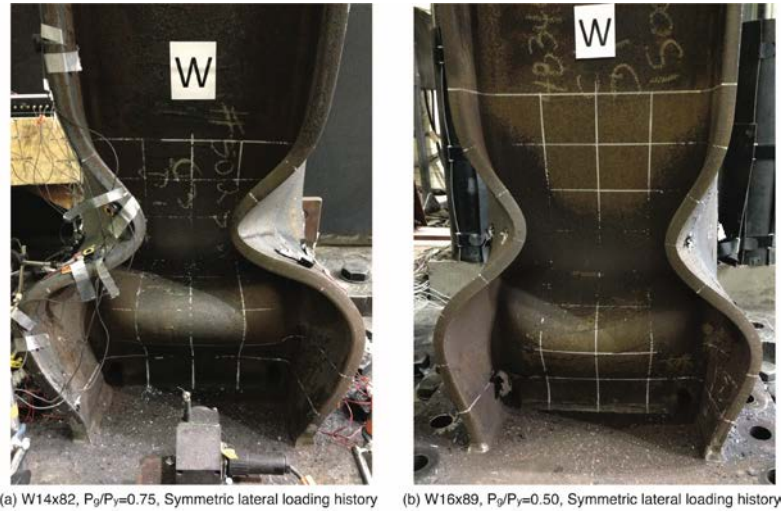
Column axial shortening and loss of axial load carrying capacity.
